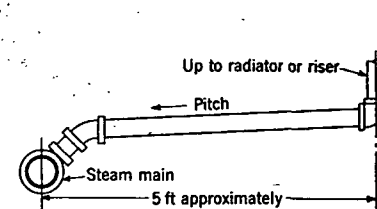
TYPICAL STEAM RUNOUT WHERE RISERS ARE NOT DRIPPED
